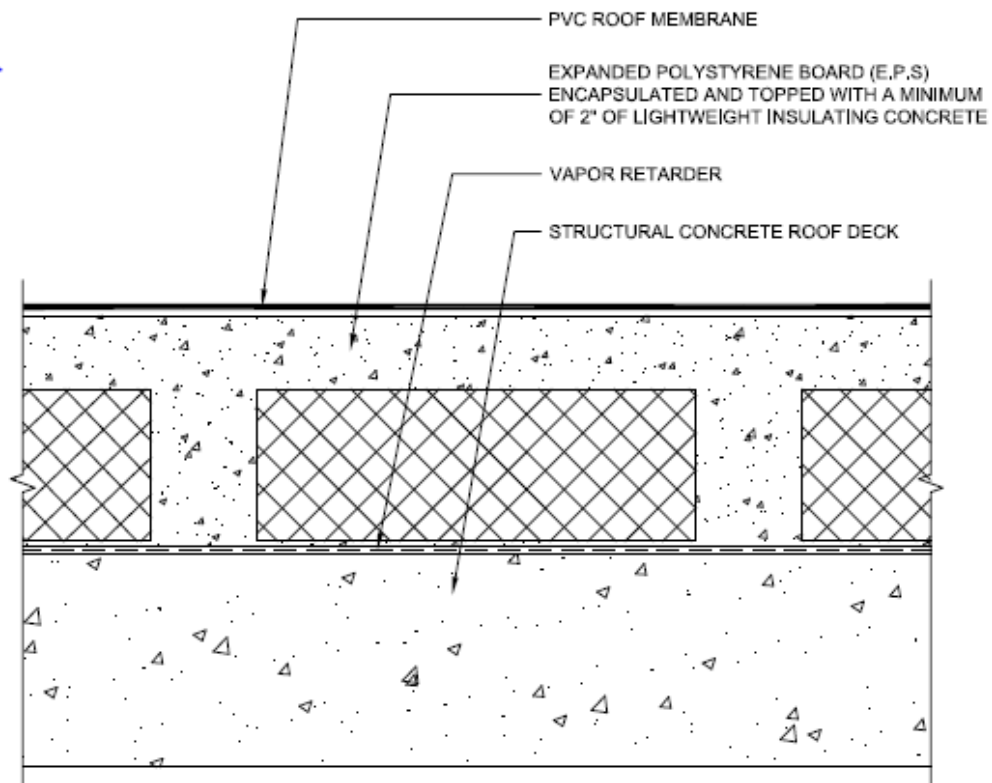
Vapor Barrier Placement on a Lightweight Structural Concrete
